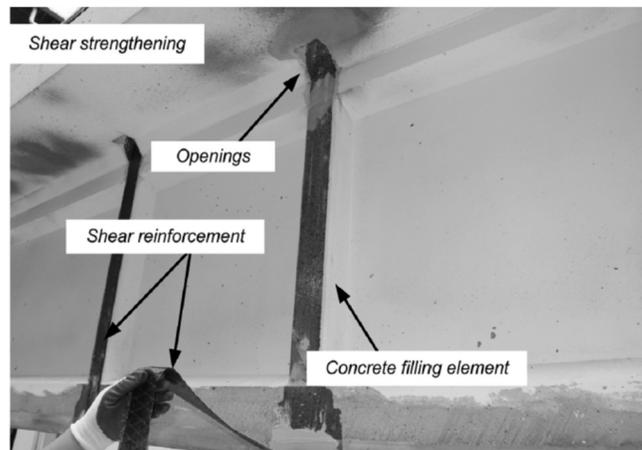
Shear strengthening of PC girders using CFRP wraps [87]
